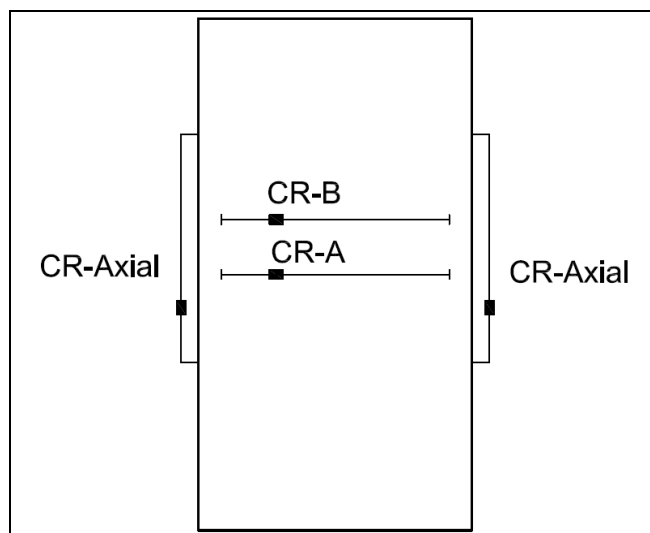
Placement of Crackmeters on the reinforced Columns.
